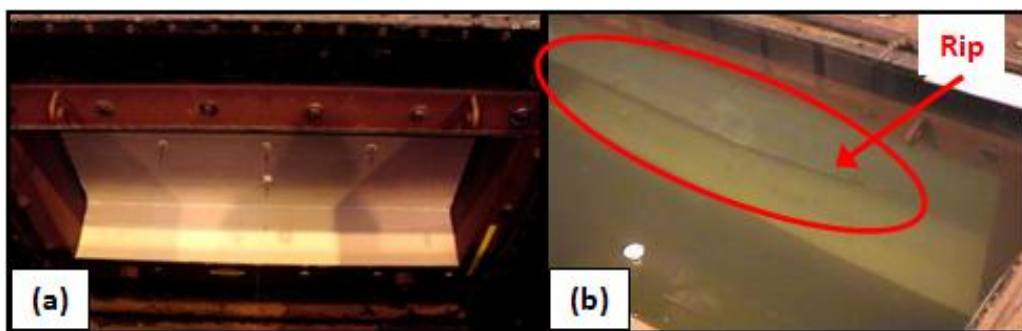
SW1. (a) Pretest photo of Wall SW1. (b) Rip in the polyurea coat propagated from left to right across the wall along the centerline mortar joint.
